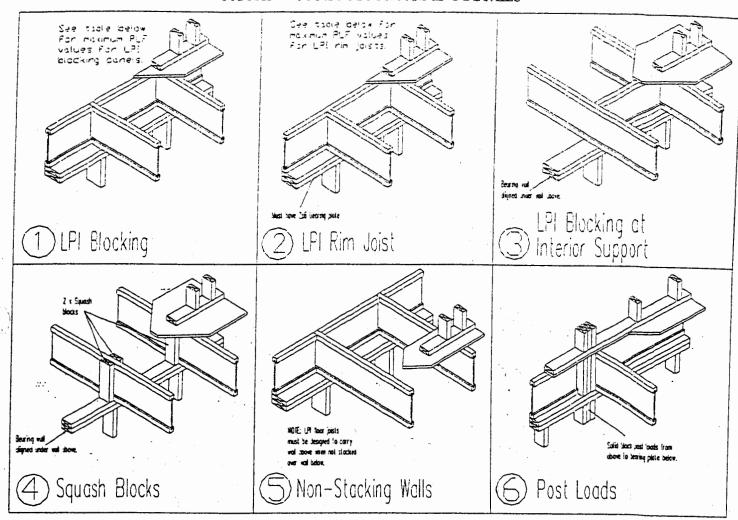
I-JOIST LOAD BEARING CANTILEVER DETAILS
